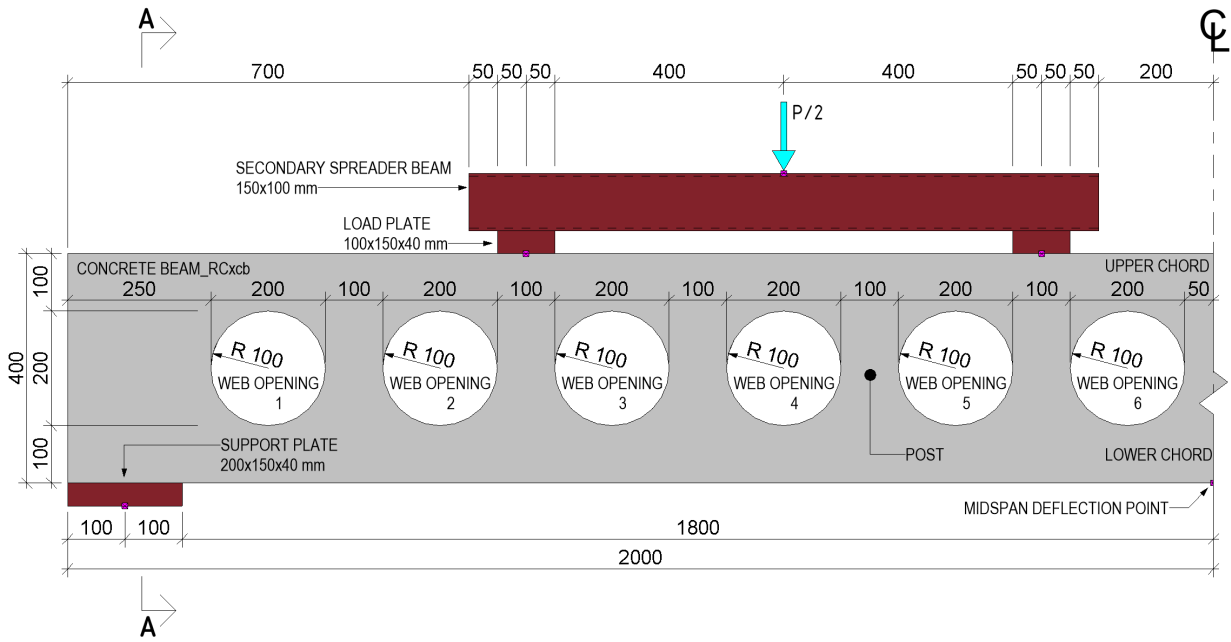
RCxcb. Geometrical dimensions given in mm. Modelling tool [Autodesk Inc., 2018].
